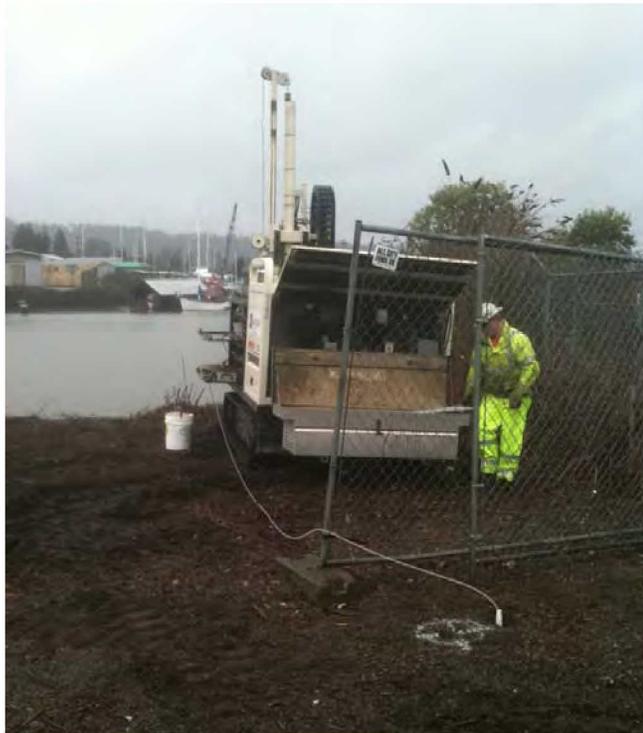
Looking northwest toward Boring T2B3 with temporary screen installed. Geoprobe rig is positioned at Boring T2B4.
